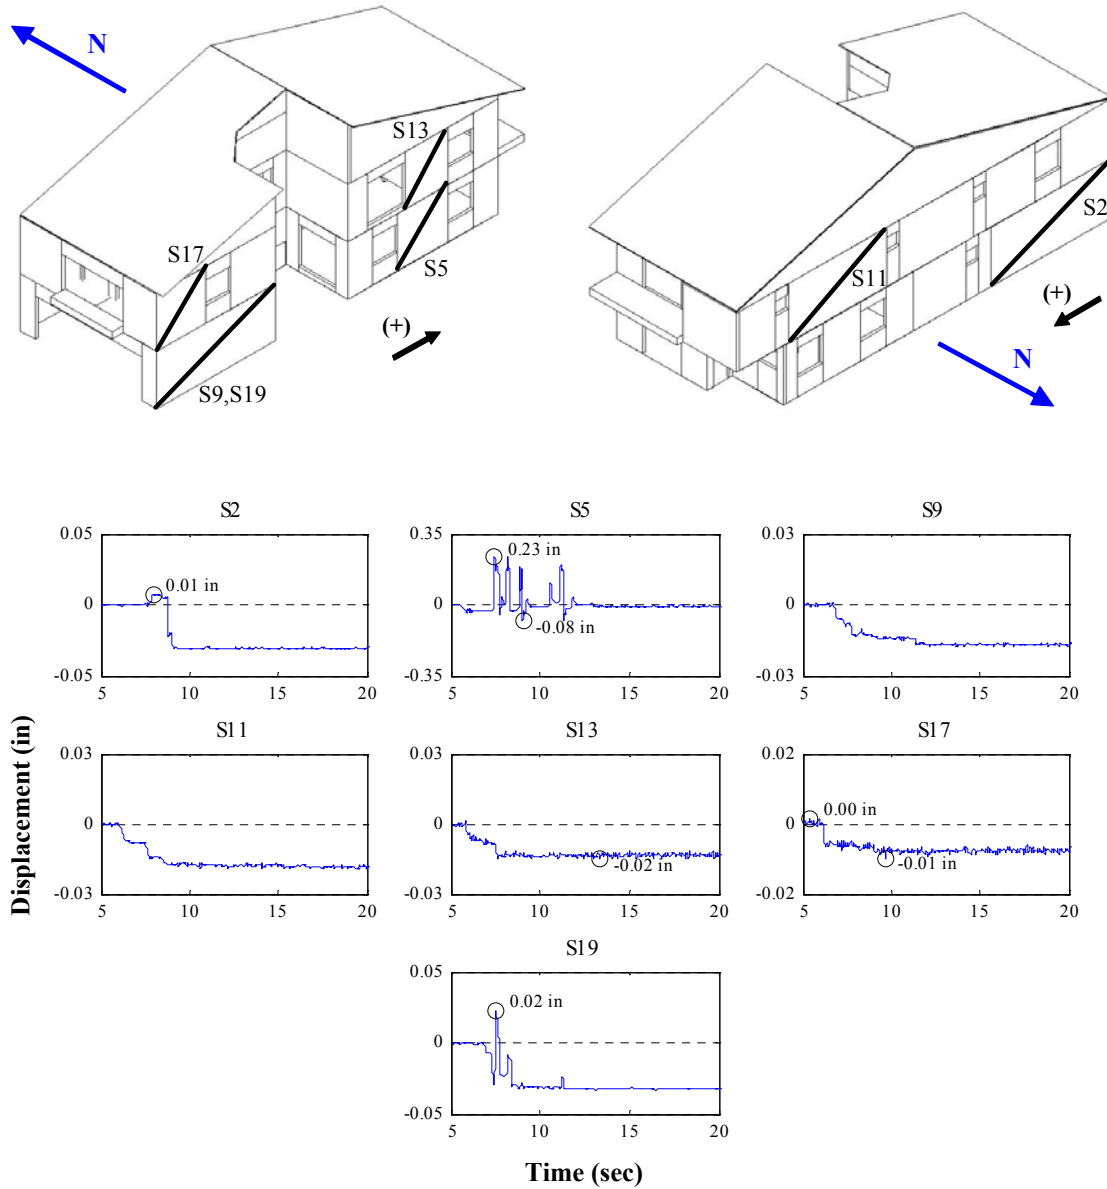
Wall deformations of east-west external walls for Test NWP5S09
